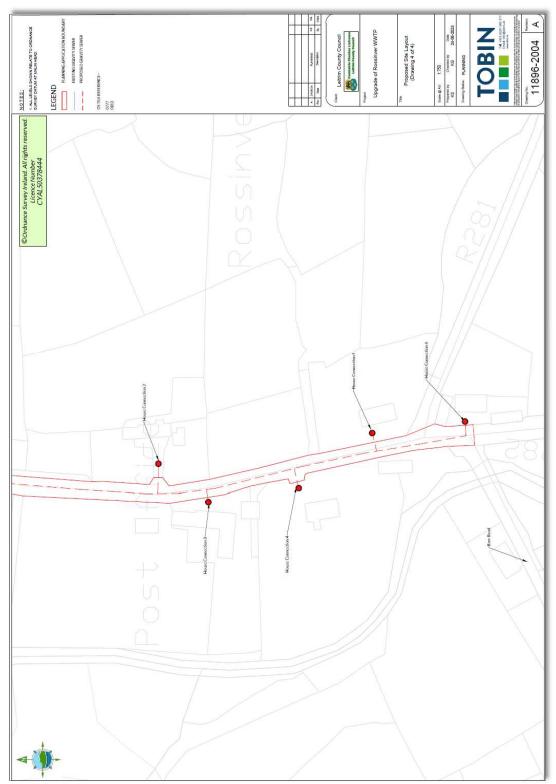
Proposed gravity sewer route to proposed pumping station at Gublaun estate (not to scale), see planning drawing ref 11896-2004.
